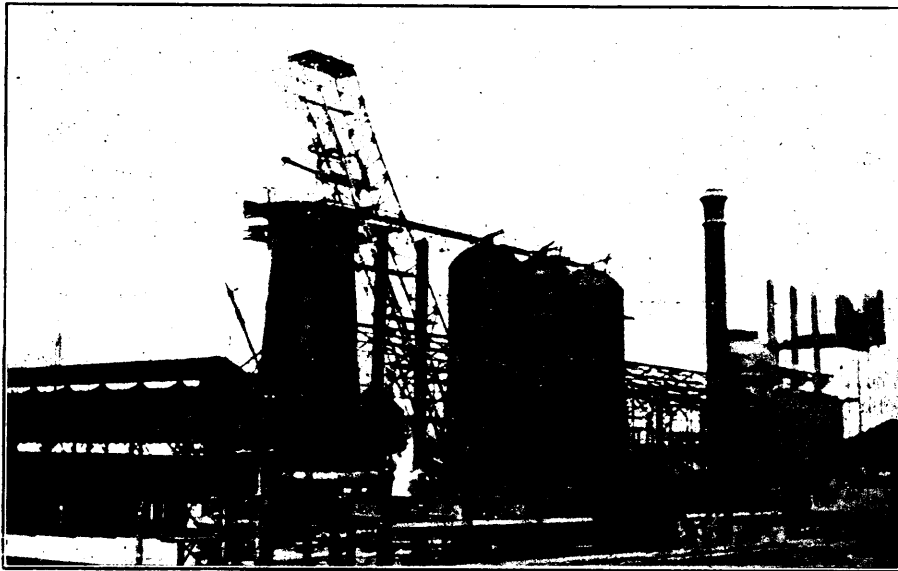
HAMILTON STEEL AND IRON CO.'S PLANT—BLAST FURNACE IN COURSE OF CONSTRUCTION.
